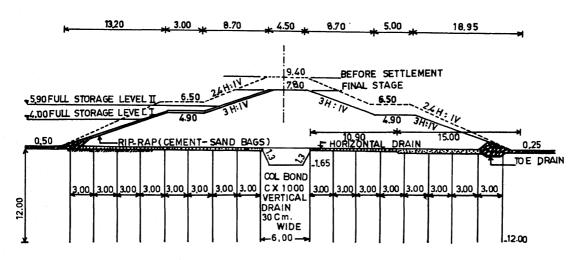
TYPICAL CROSS SECTION OF MANGGAR BESAR DAM
